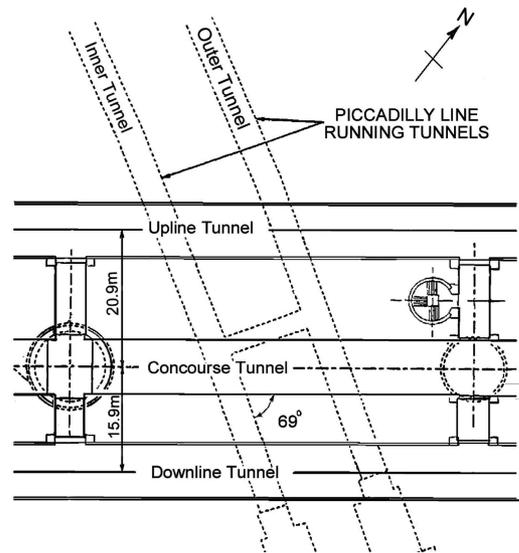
Layouts of the Piccadilly Line tunnels and the Heathrow Airport Express tunnels.
